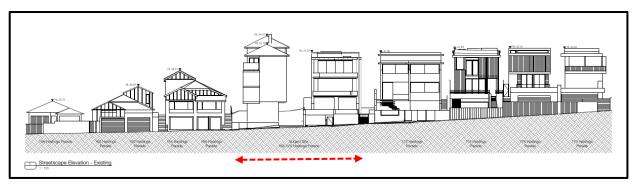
Streetscape elevation of the existing developments on the site, showing its relationship to the predominant building bulk, scale and height of buildings within visual catchment of site. (Source: SJB Architects)
